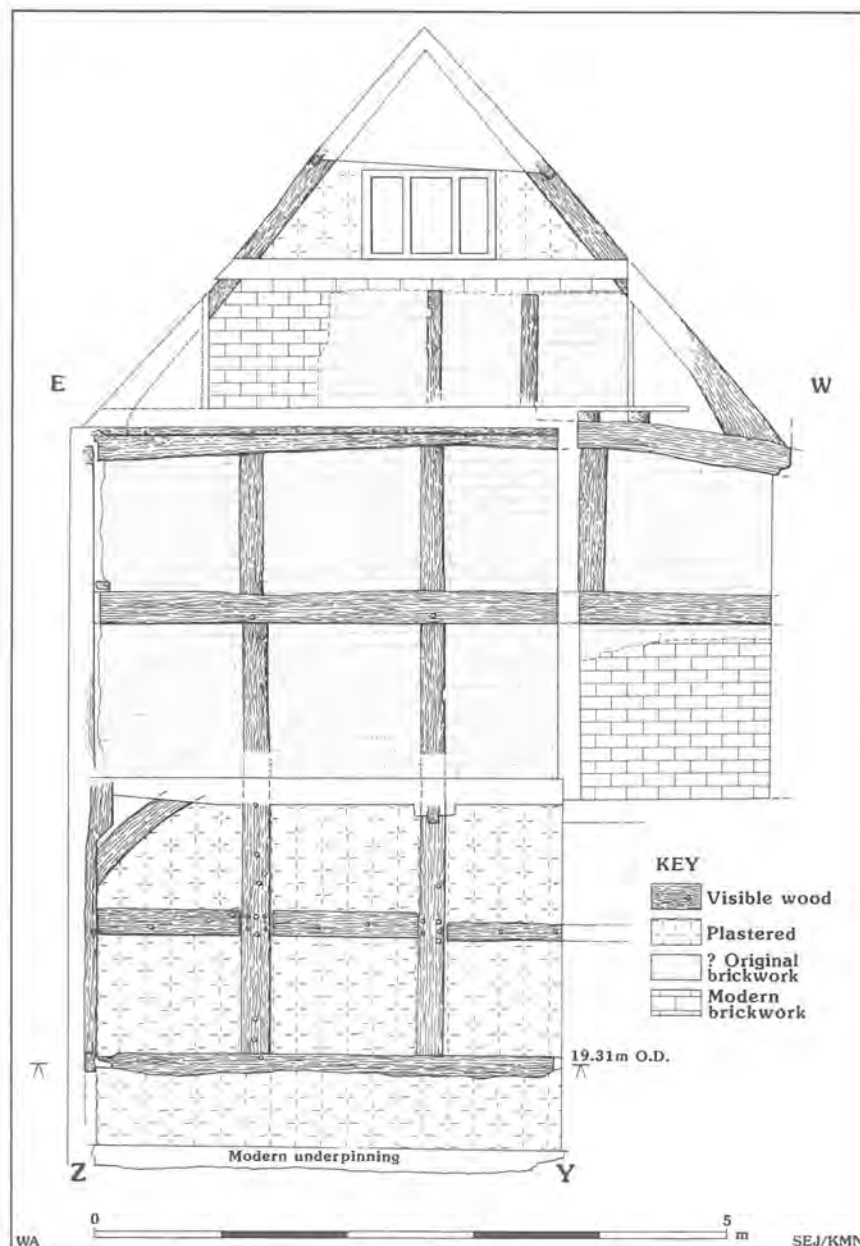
29 High Street: East Bay- Composite Internal Elevation.
